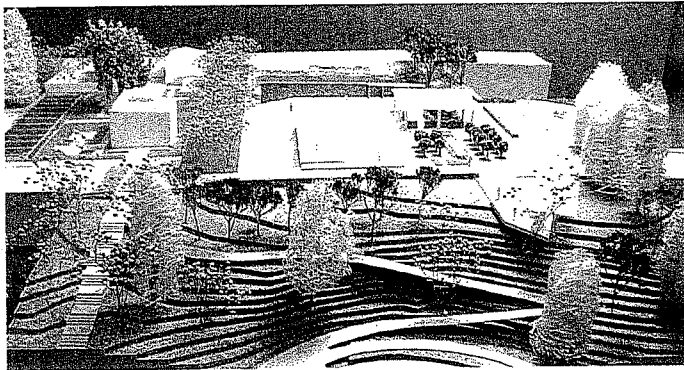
View of Interpretive Ramp and Stair, Site Model
